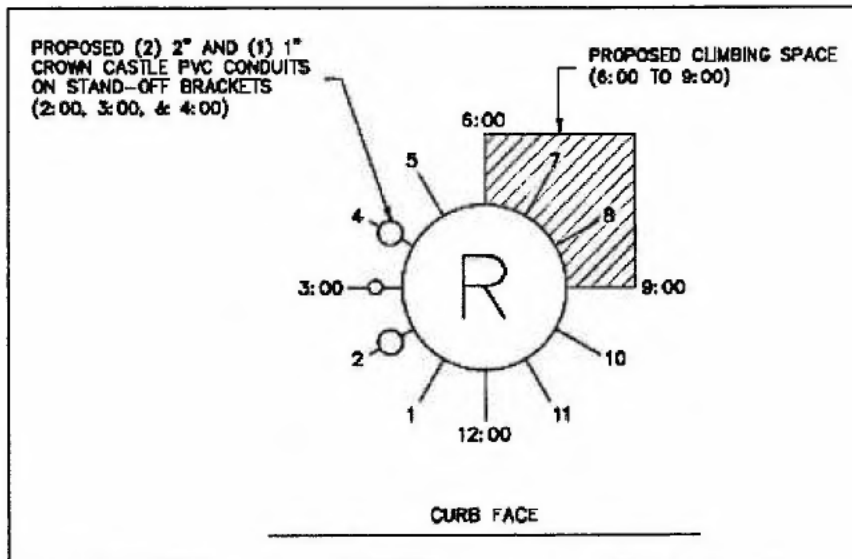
Inverted pole configuration (Source: Plans A-1 Panel 3).
